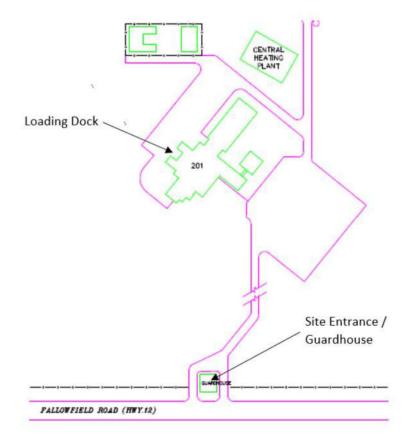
Site Map, noting entrance to the site of Fallowfield Road and loading dock location.
